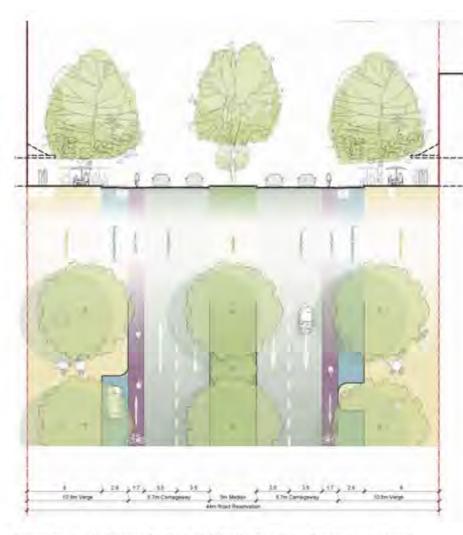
Typical Cross Section of John Gorton Drive (town centre core)
